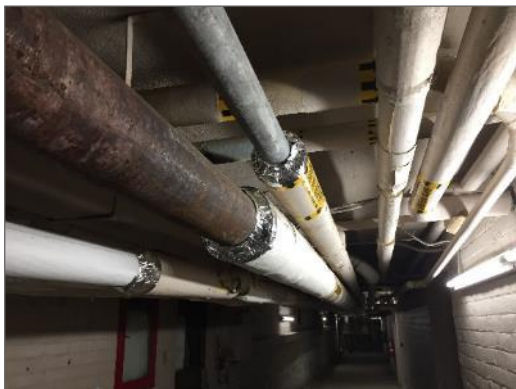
Aircell in fair condition, Corridor at gate to R Wing, M Wing Basement.
